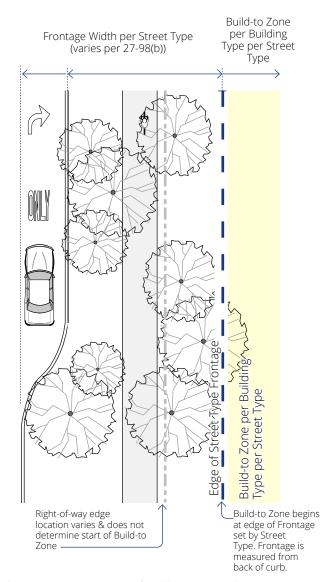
Location of Build-to Zone in relation to Frontage
